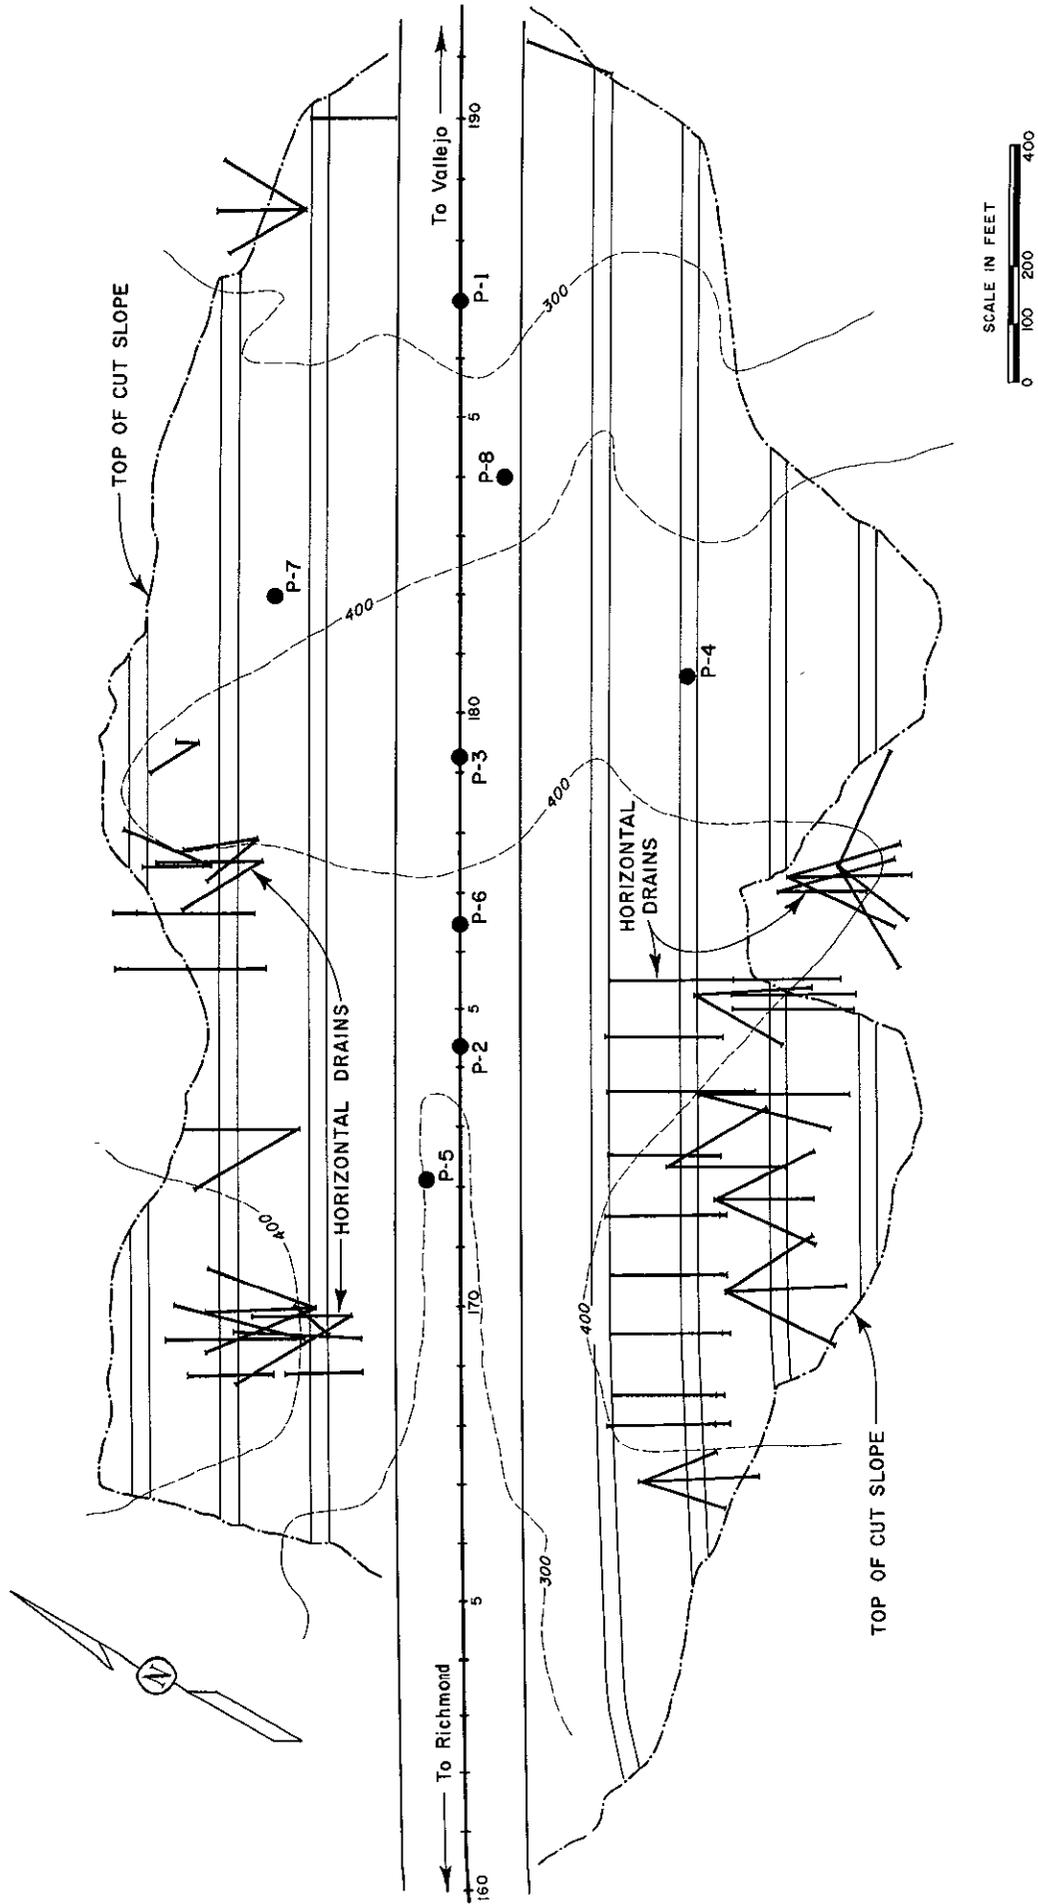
PLAN VIEW OF CARQUINEZ CUT SHOWING HORIZONTAL DRAINS AND BORING LOCATIONS
